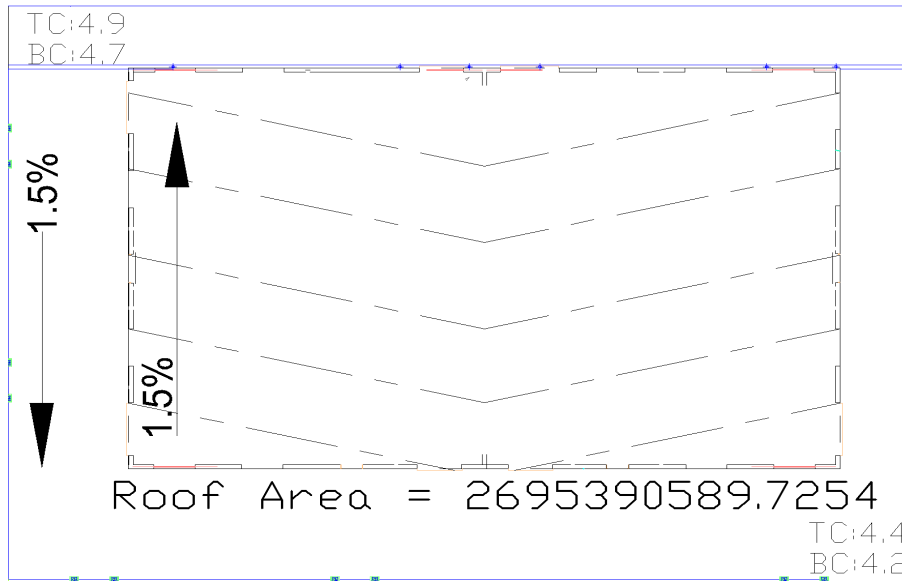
AutoCad plan of the building sector with the roof as the main area.
